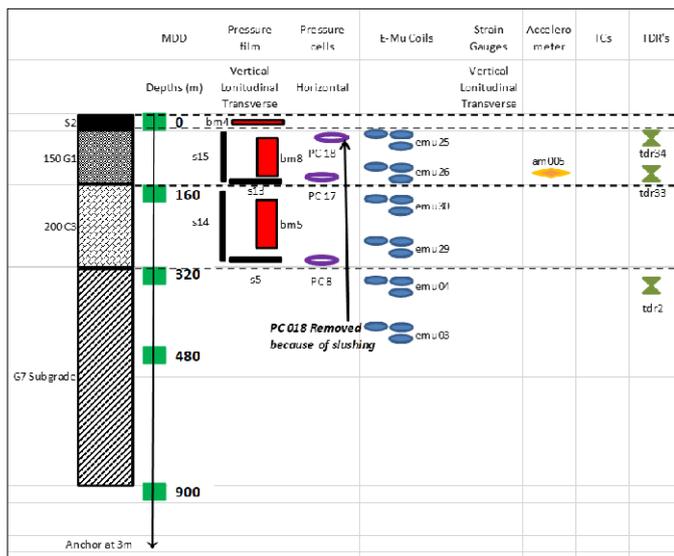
Instrumentation of the pavement systems and traffic loading.
